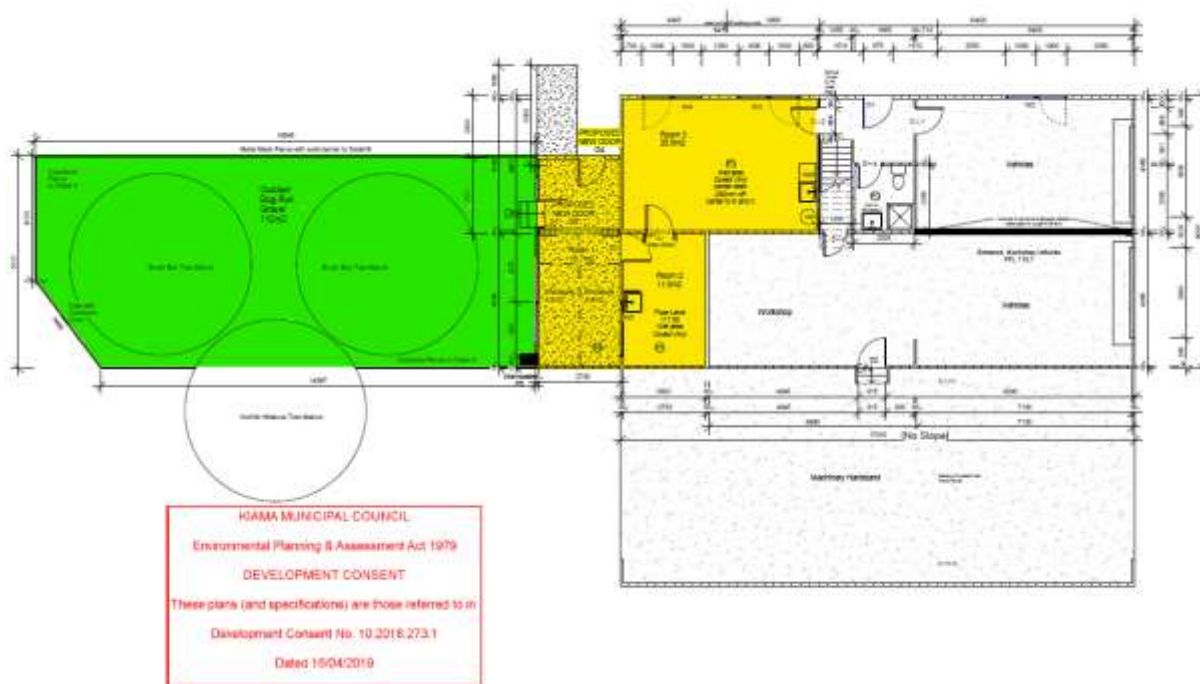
Floor Plan of Dog Facilities (Highlighted Green is the Outdoor Gravel Run & Highlighted Yellow is the Rooms 1, 2, and 3)
